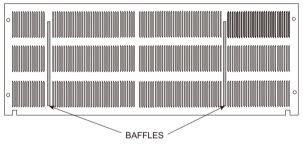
Remove Existing Outdoor Grille Baffles on Competitive Grille
